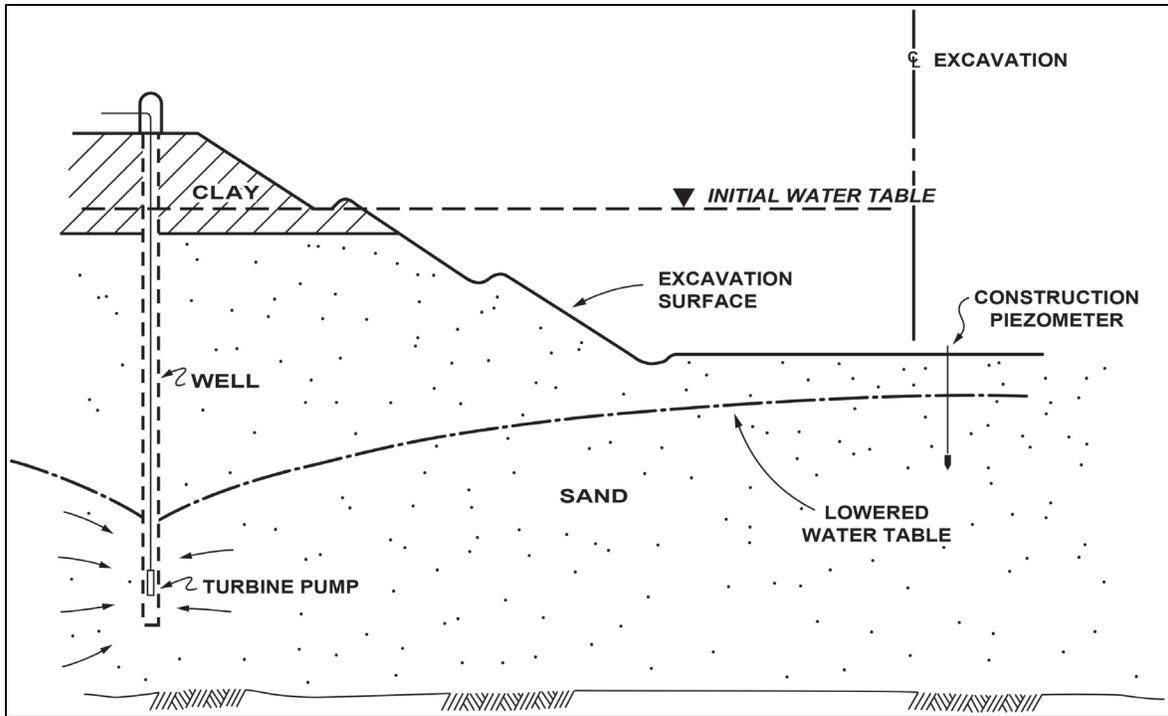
Deep-well system for dewatering an excavation in sand (Adapted from TM 5-818-5)
